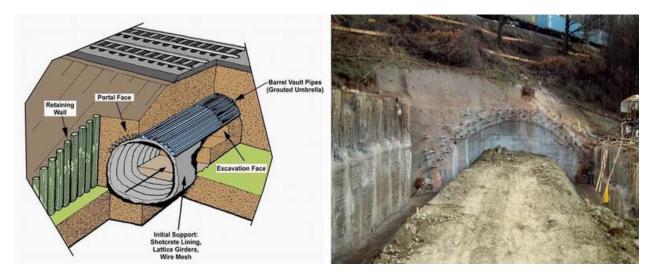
Illustration of the *BVM* installed under rail embankment. Figure 13b: Barrel Vault tubes installed beneath active rail line - Oberrieden, Germany 1990
